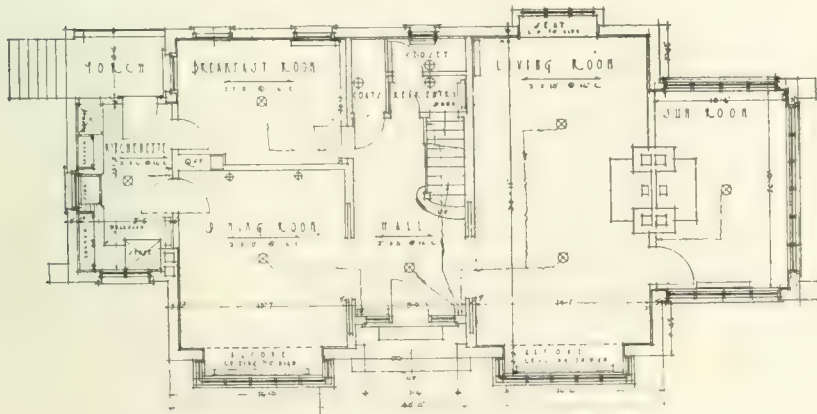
Ground floor plan of house shown in Fig. 9.
